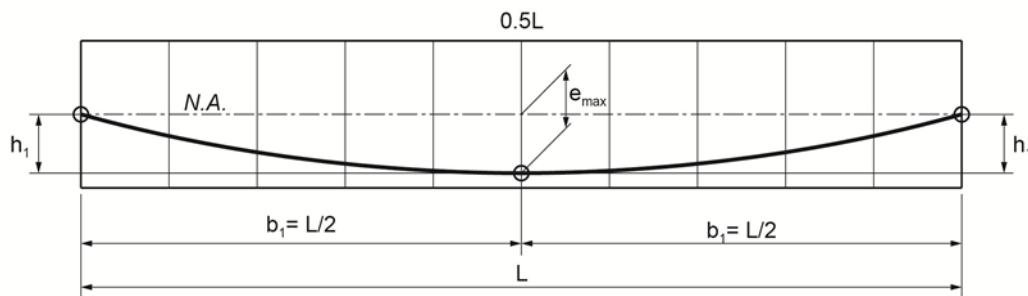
Parabolic Tendon Profile for a Simple Span Girder
